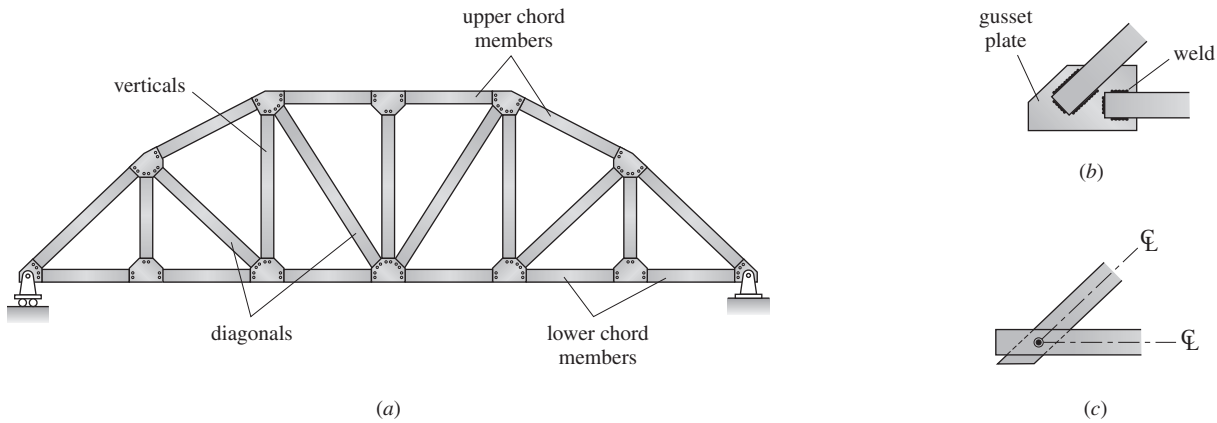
(a) Details of a truss; (b) welded joint; (c) idealized joint, members connected by a frictionless pin.
